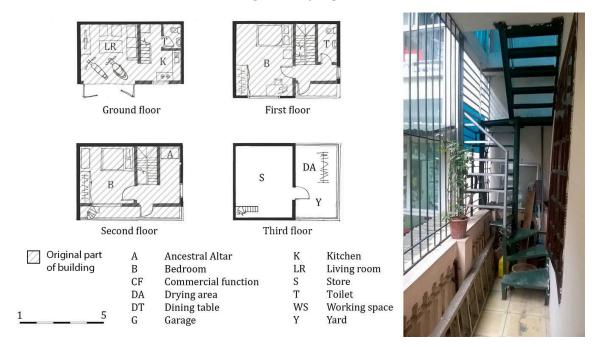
Extended spaces in vertical axis. (Left) new floor plan, (Right) an iron stair is using to connect second floor and third floor.
